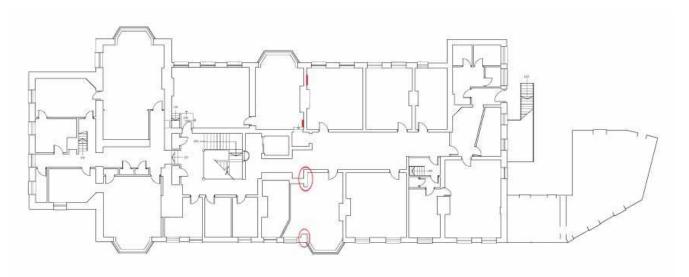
Plan of the first floor of the modern house, with the existing evidence for the earlier western wall ringed.
